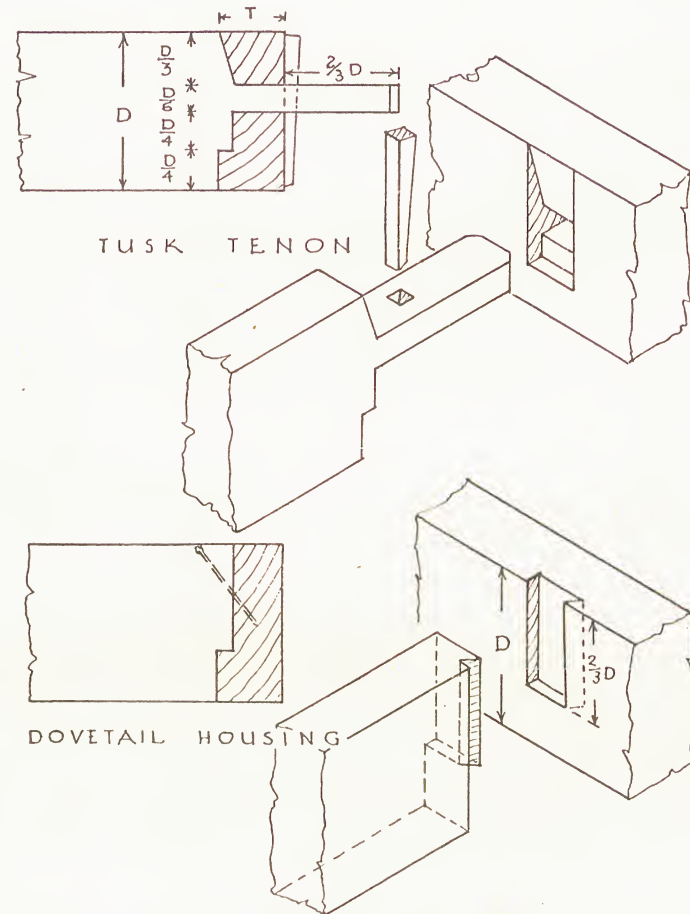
(Top) Tusk tenon used to join trimmer joists and trimming joist. (Bottom) Dovetail housing---a simpler joint used for joining ordinary joists to trimmer joist.
